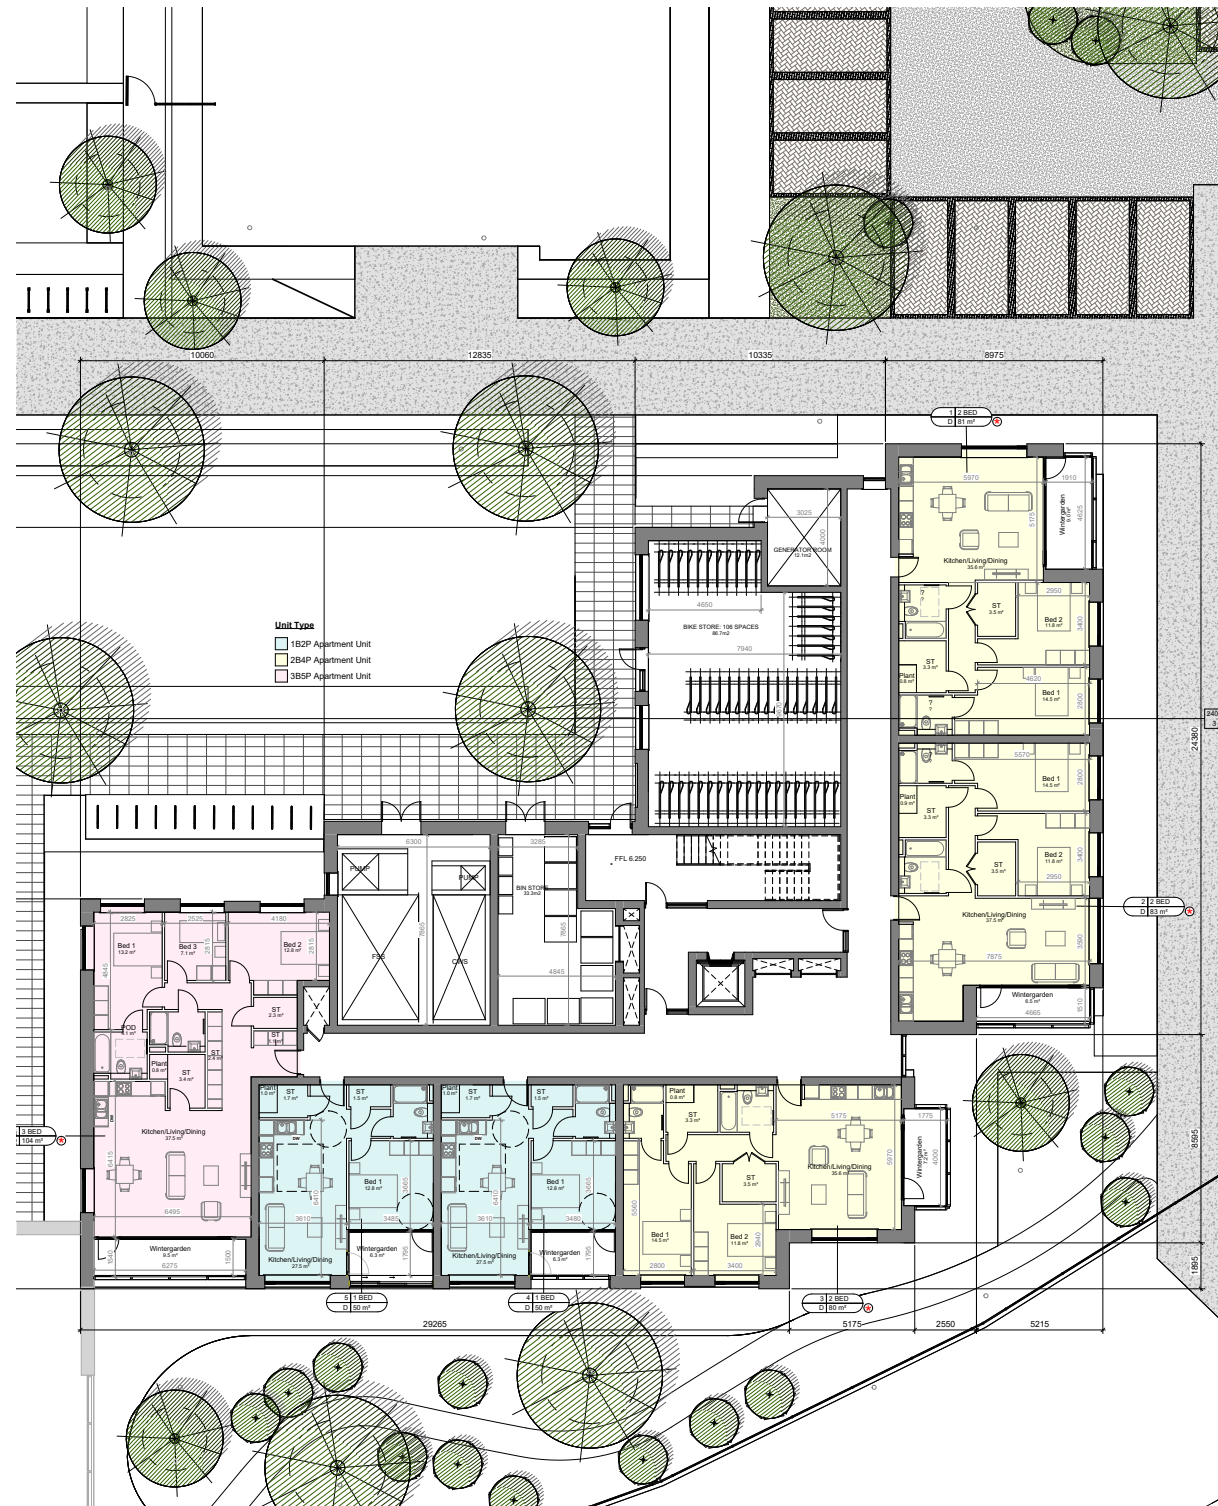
Block D- Ground Floor Plan Source: MCORM, 2026.
